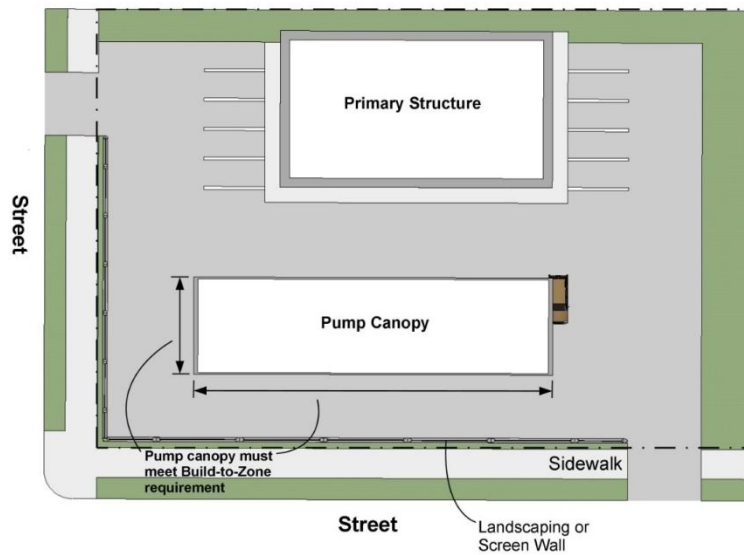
Fueling Stations in Suburban Context; 17.7.6.3:B.1.a
